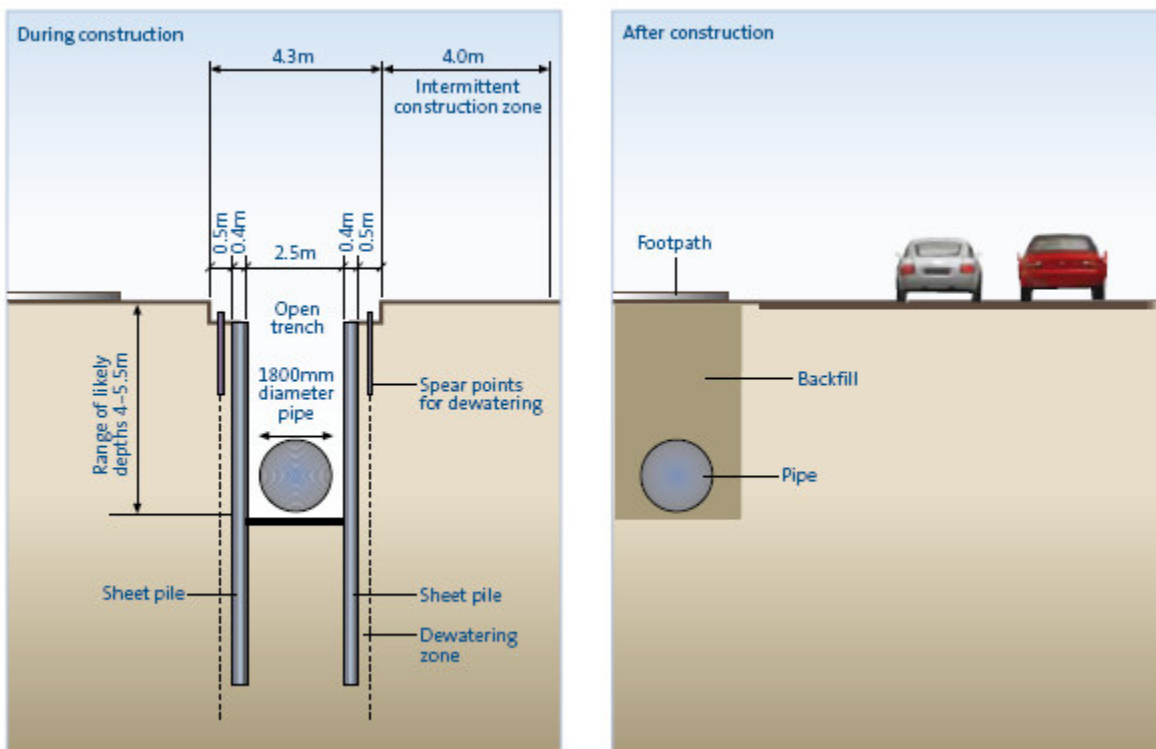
Typical cross section of trenching construction on land (in a constrained area)
